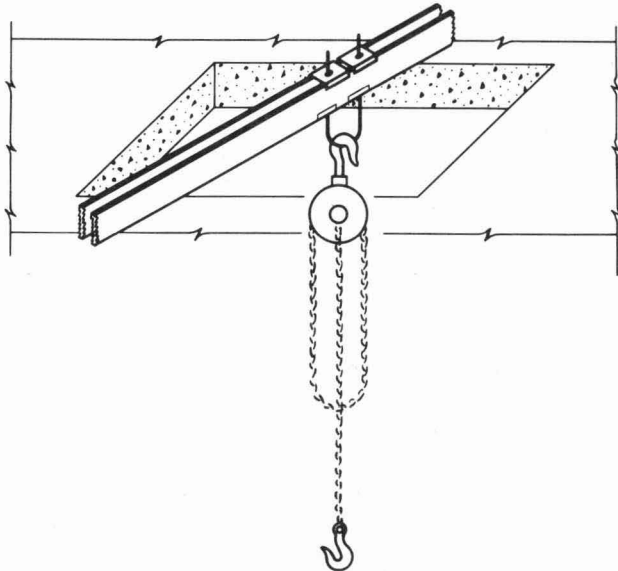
JOB MADE HOISTING CENTER (Para. 3.6) ←
